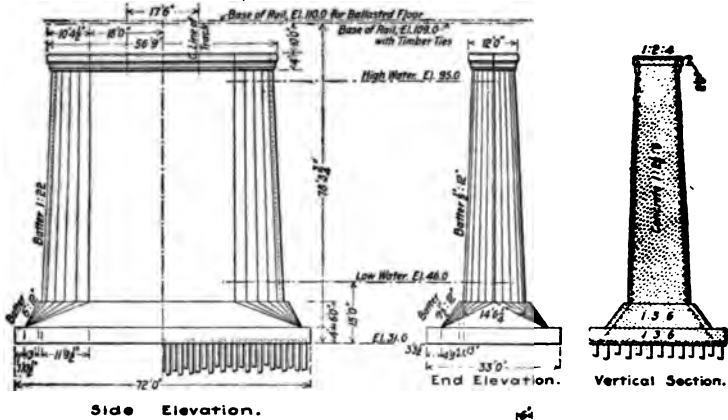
Hollow Pivot Pier, Gilbertsville Bridge, Illinois Central R.R.
